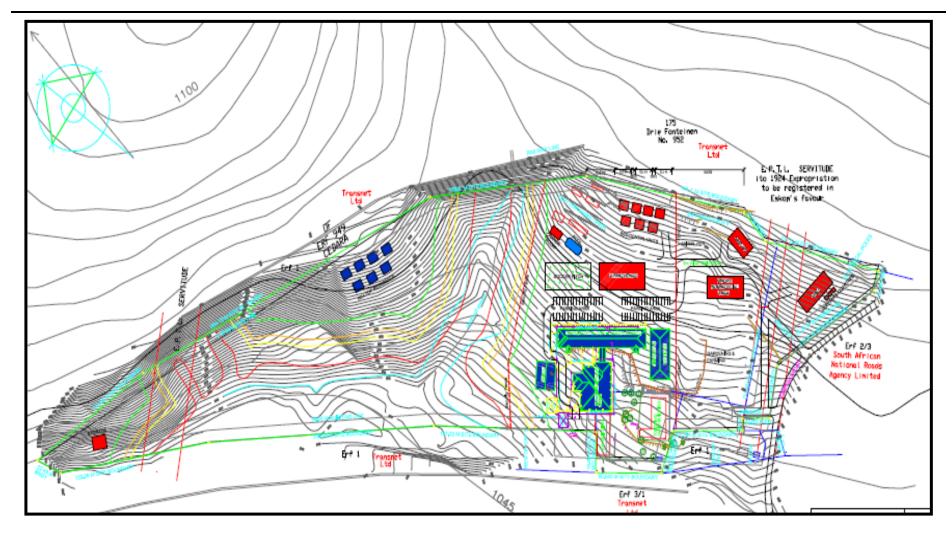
Plans for Proposed Madrassa An-Noor for the Blind Facility
